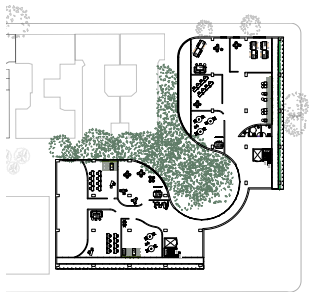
5TH FLOOR WYANDALE HIGH SCHOOL
